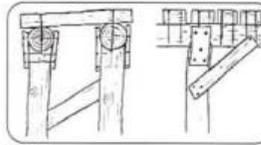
BRIDGE STRINGER SUPPORT AND CROSS BRACING
